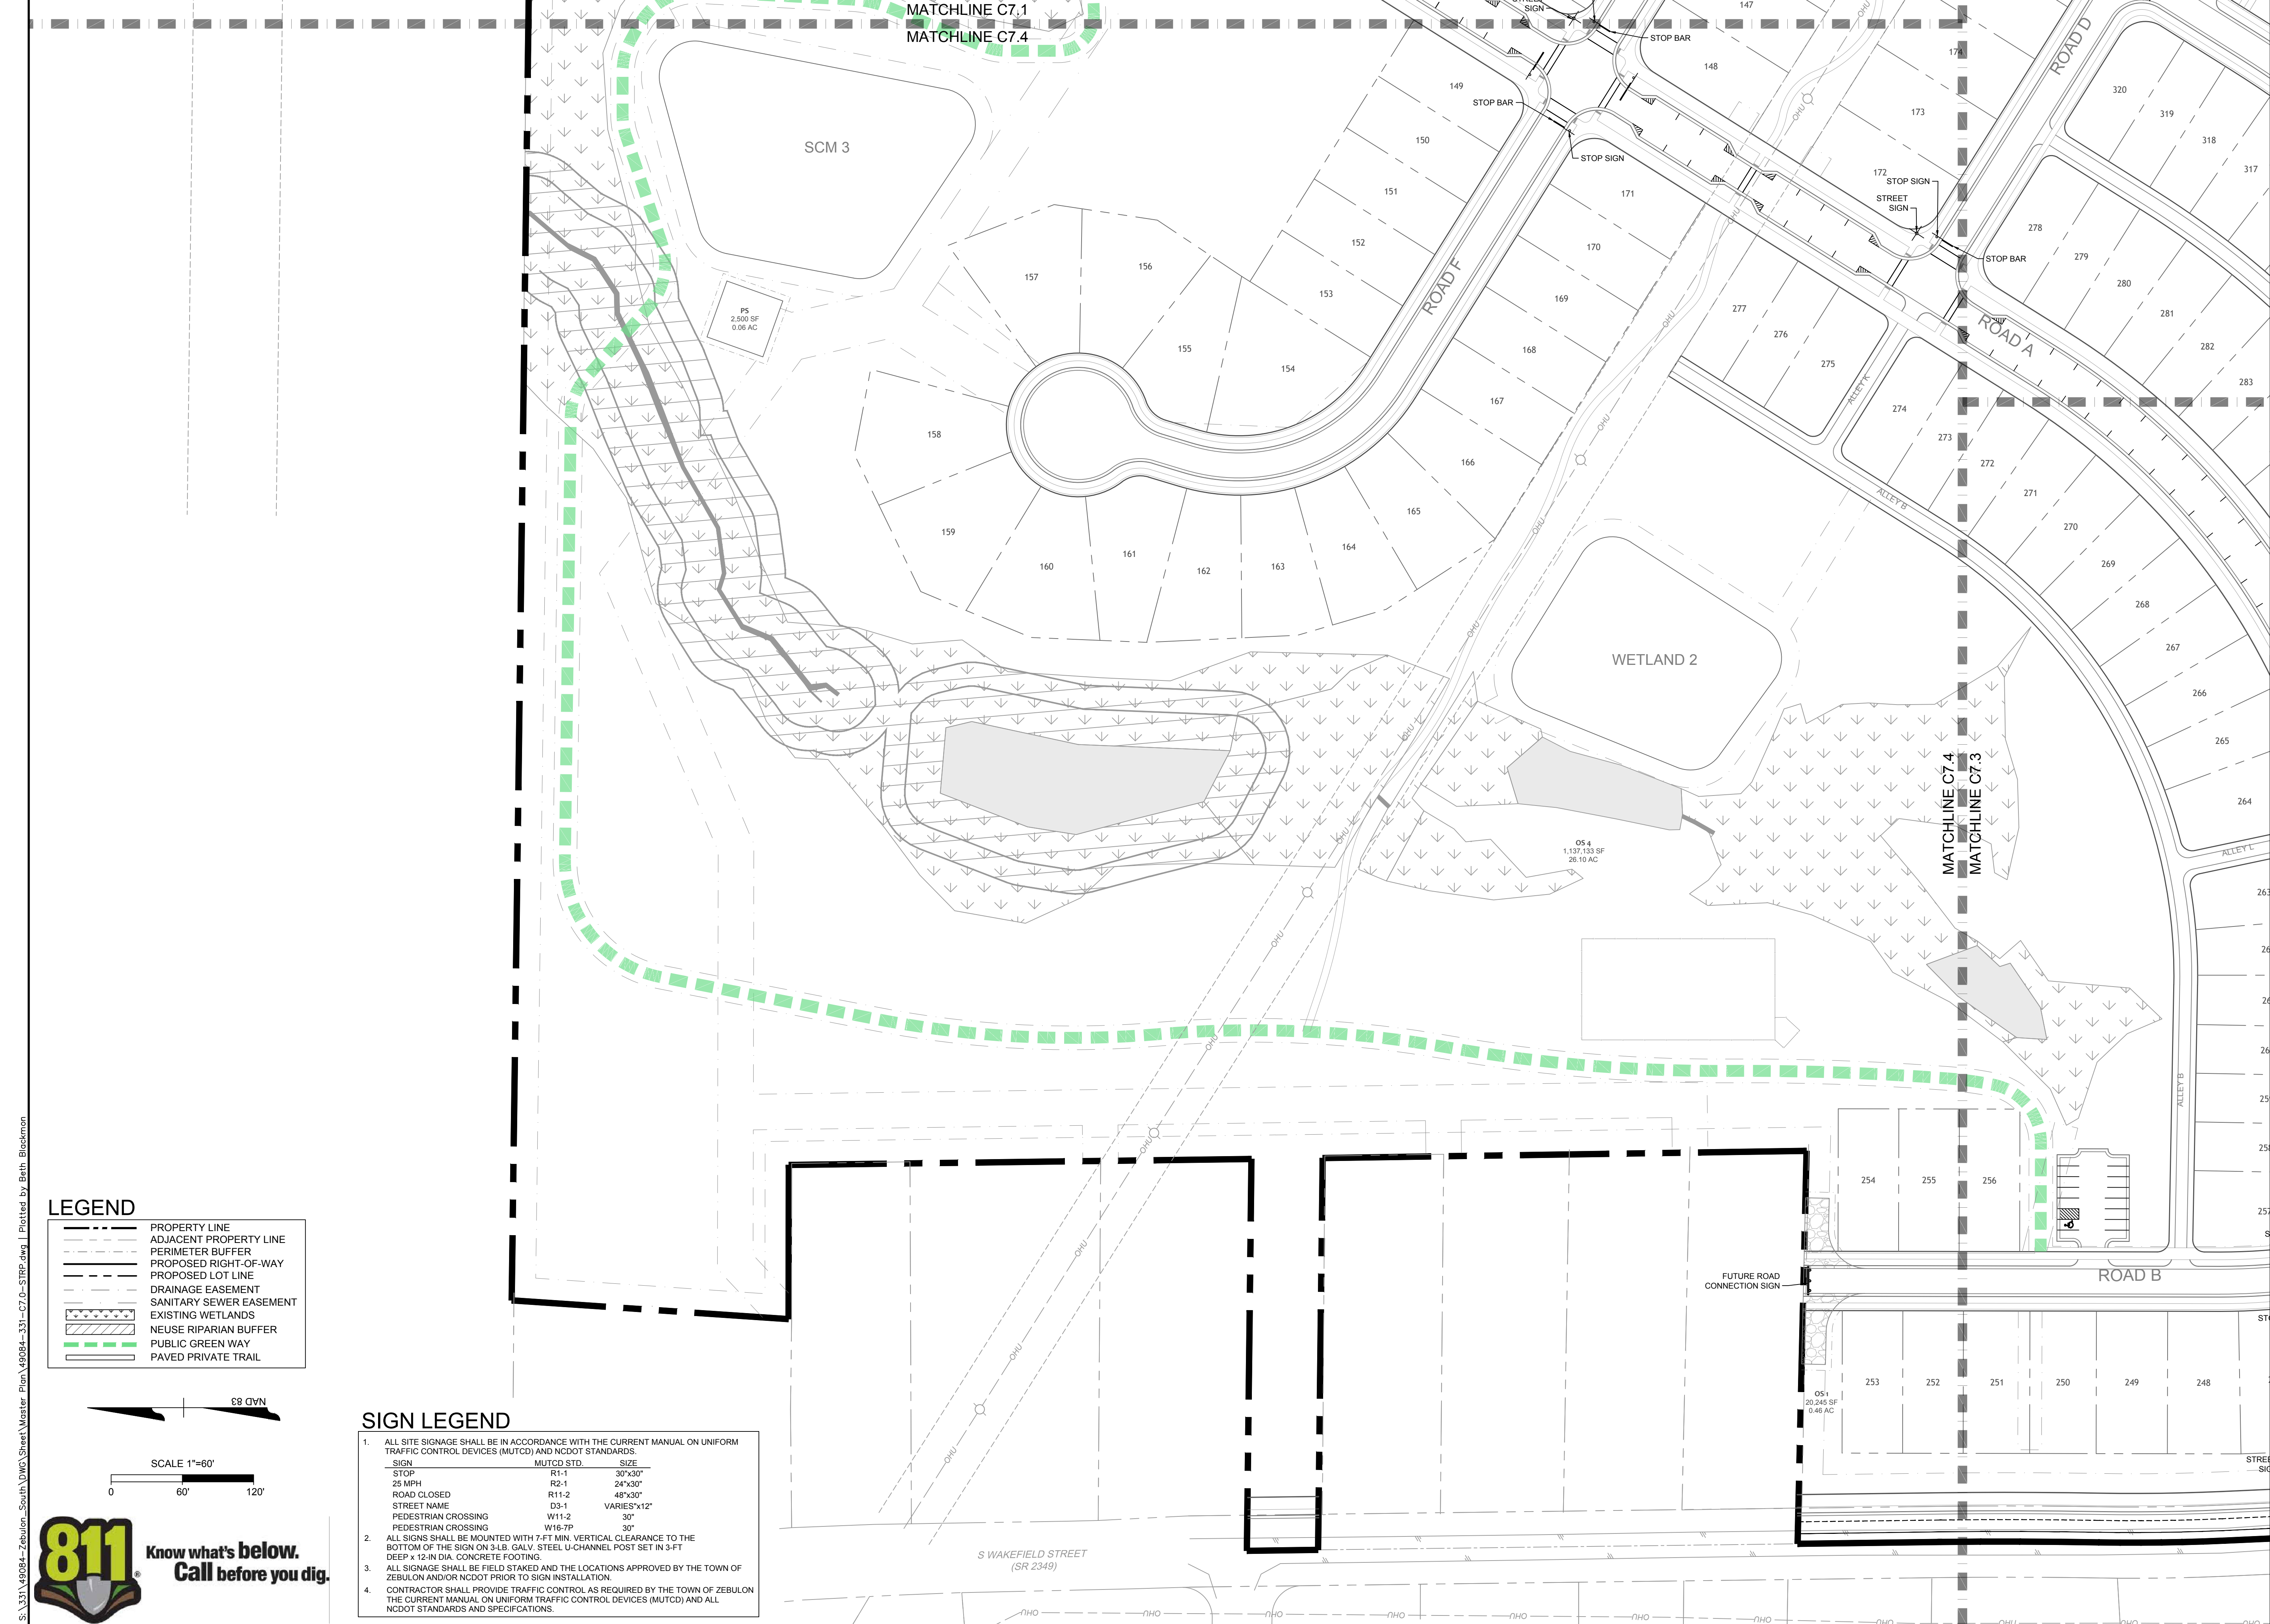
DETAILED SIGNS & MARKINGS PLAN SHEET 3 OF 4
